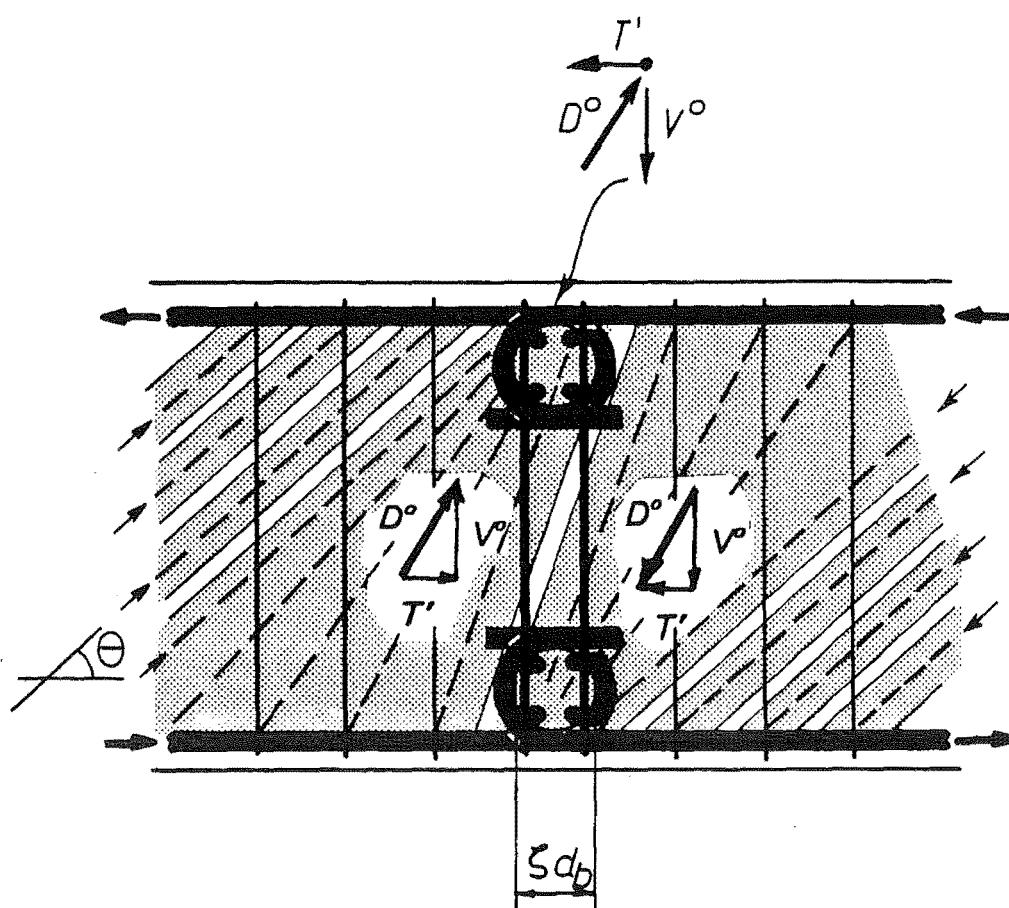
Truss Model for Midspan Connection with Overlapping Hooks.
